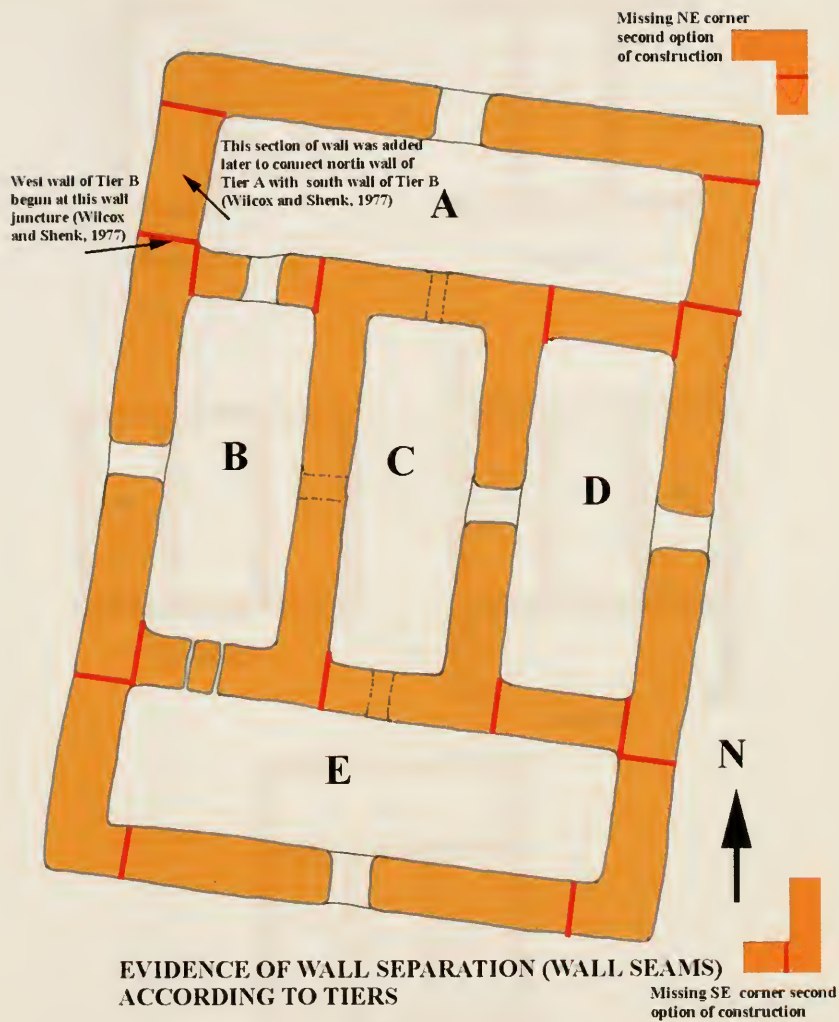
Plan of the Great House with all wall seams and reconstruction of missing corners
